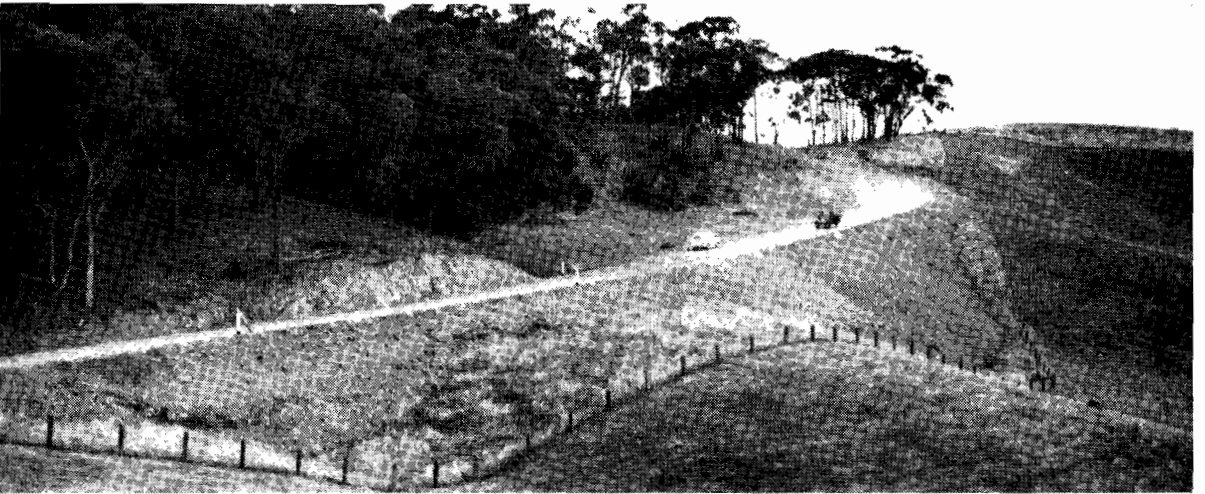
After reconstruction and realignment of Wodonga-Beechworth Road approaching Indigo Creek.
